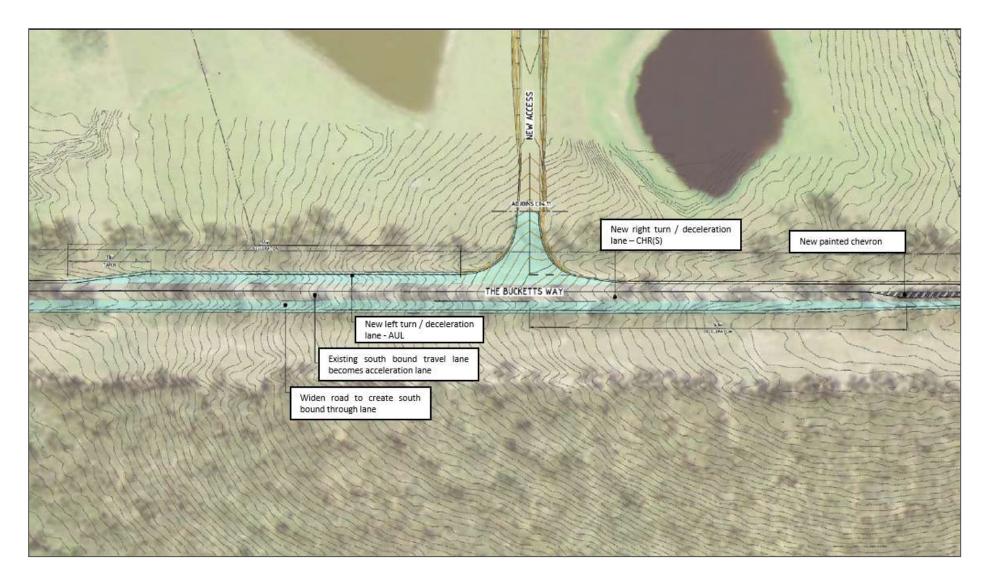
| Proposed quarry access road intersection on The Bucketts Way
